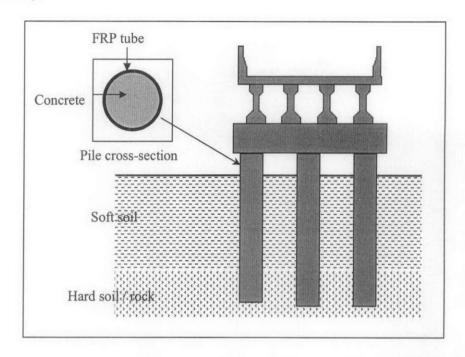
Typical bridge substructure with a concrete-filled FRP tube support system
